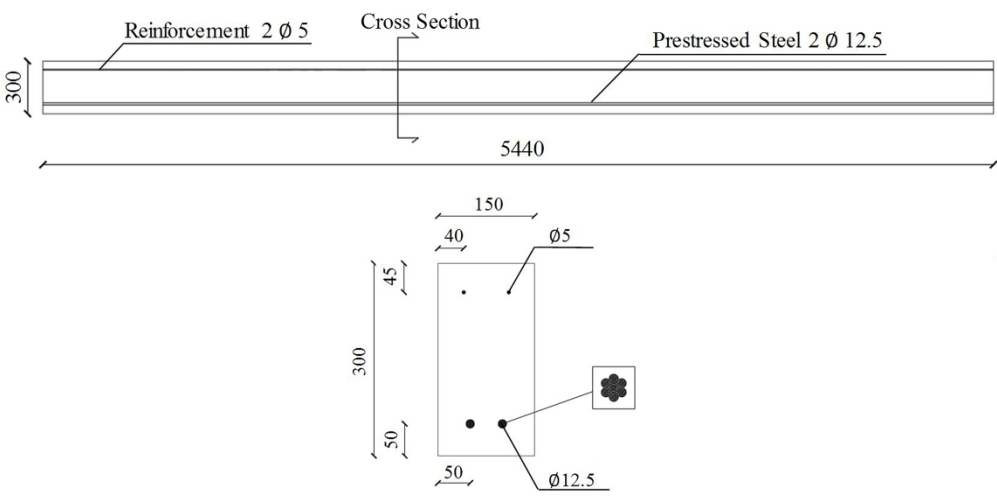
Longitudinal section and cross section of VIGA 470 beam [mm].
